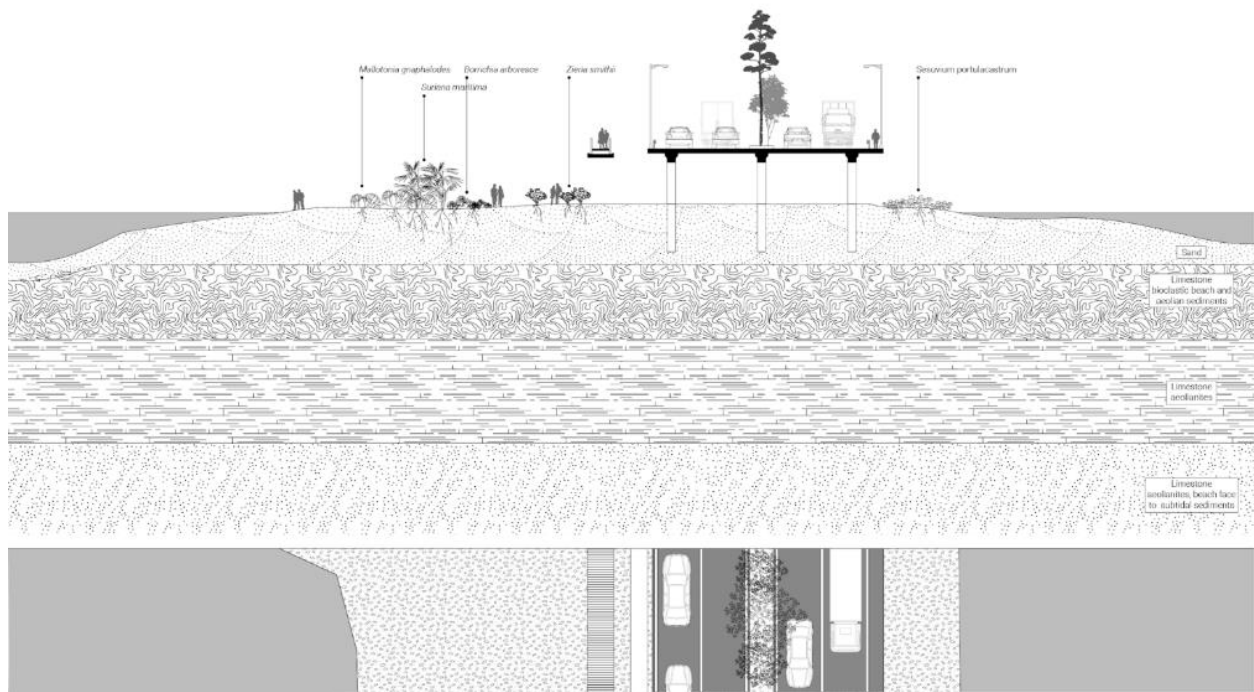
A preliminary design proposal for the bridge, crosssection and aerial view
